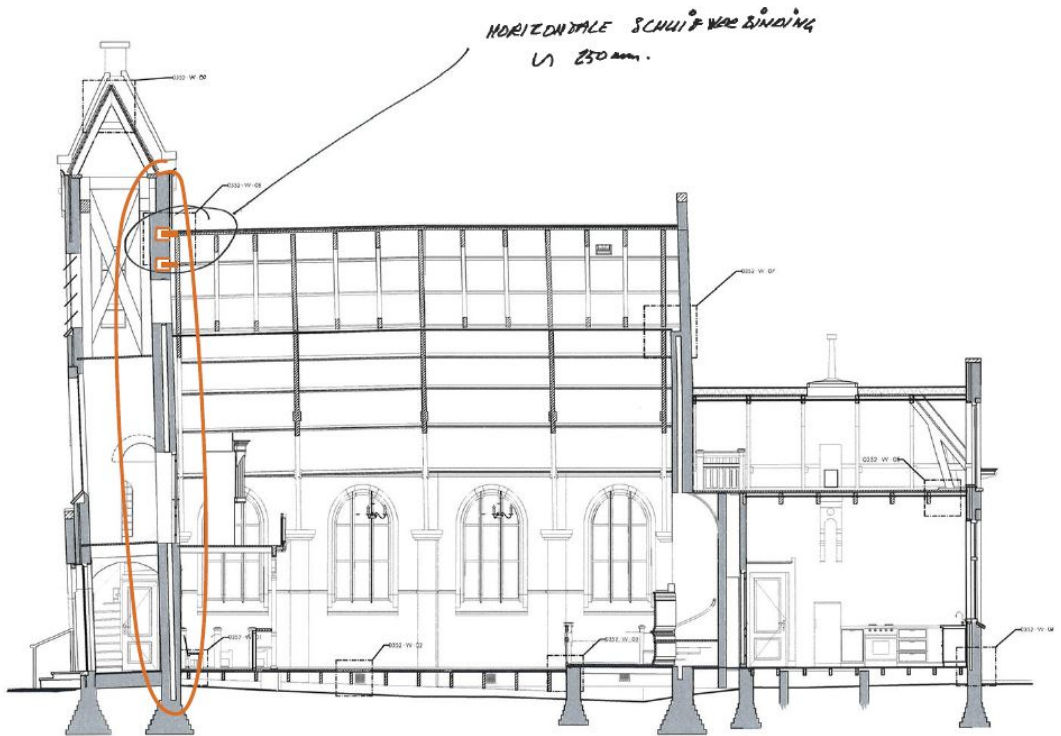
Disconnected tower due to cavity wall (indicated by orange)
